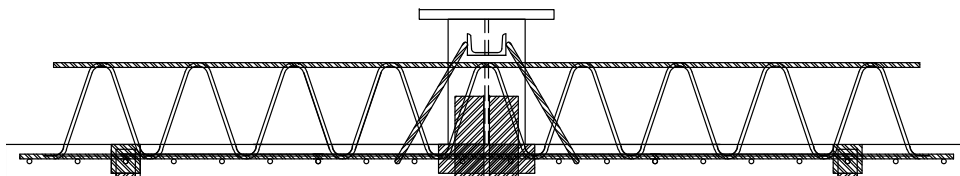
Cross-section of the deck slab with a steel stabilizing beam and the embedded steel plates intended for the connection with the girder webs
